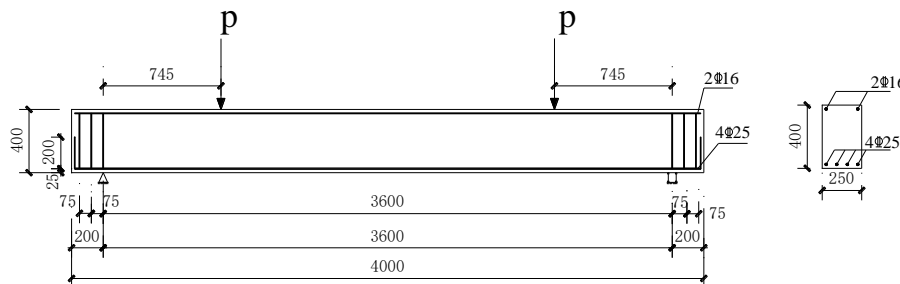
Dimensions and reinforcement details of specimens (dimensions in mm).
